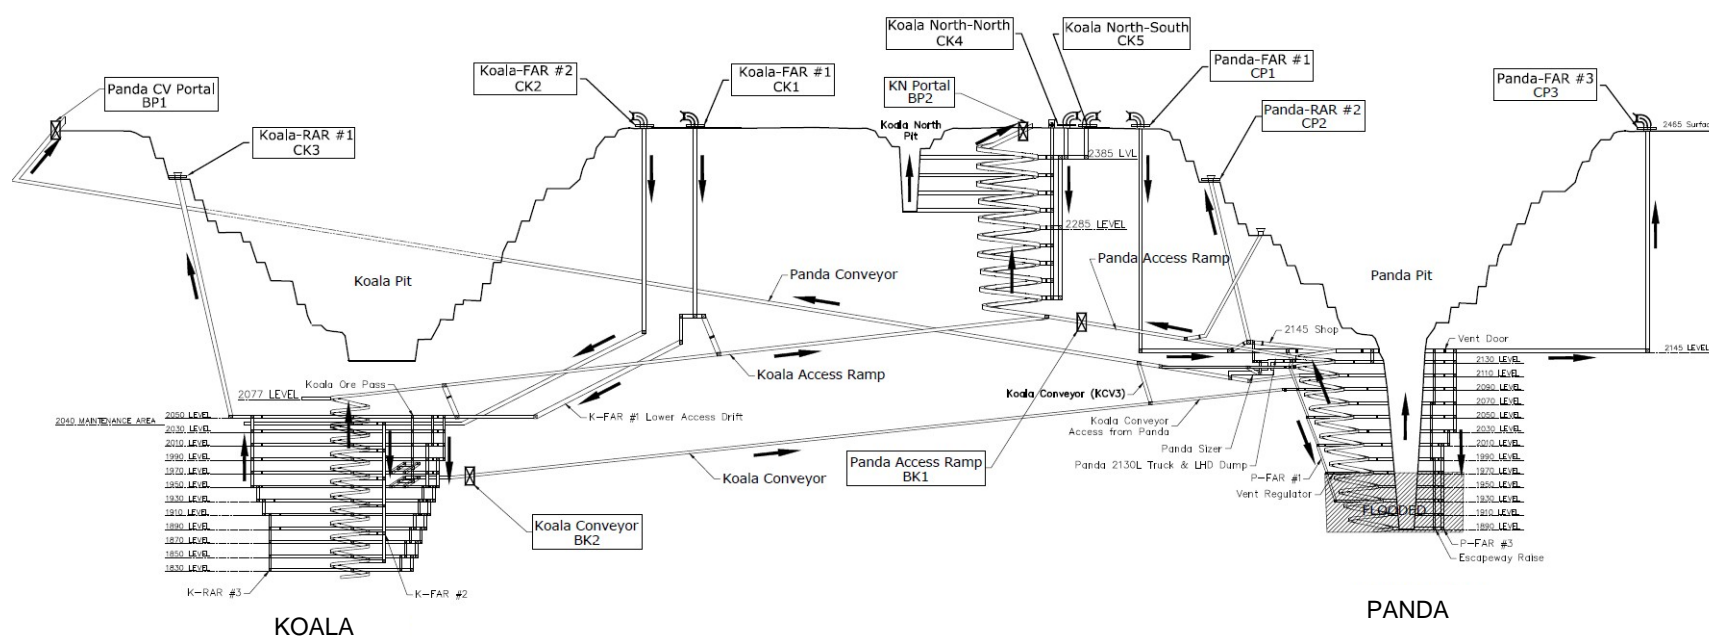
Schematic of Layout of Panda and Koala pits and Underground Workings
